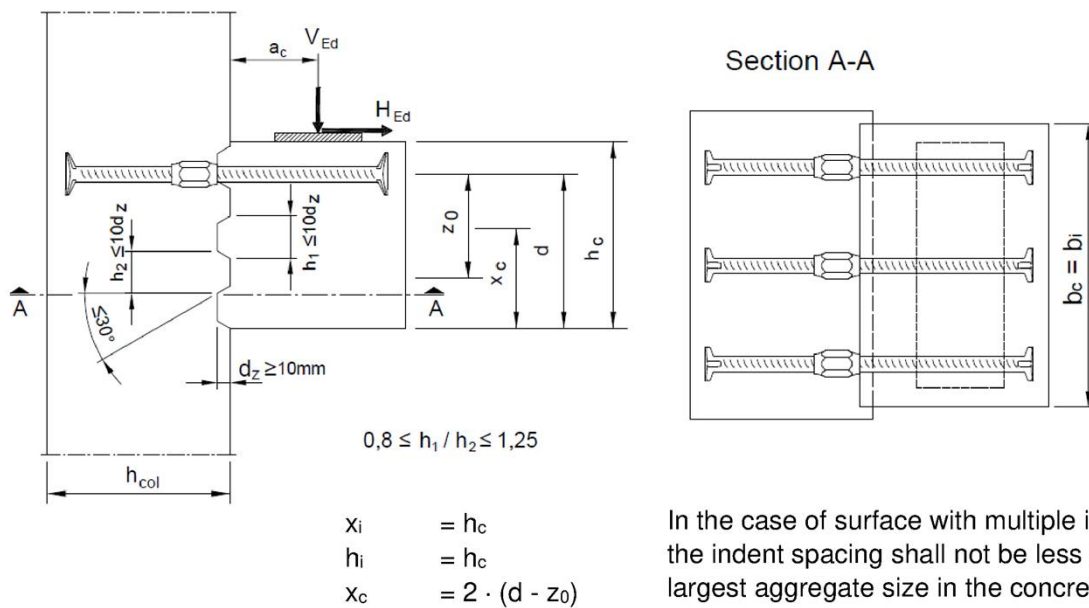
Dimensioning and detailing of indented construction joints (Type A)
